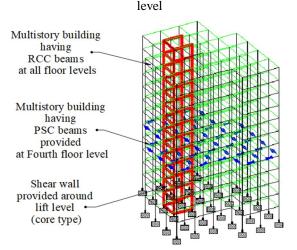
Model OPSC-BIV - General Structure with PSC beam provided and interchanged at fourth floor
